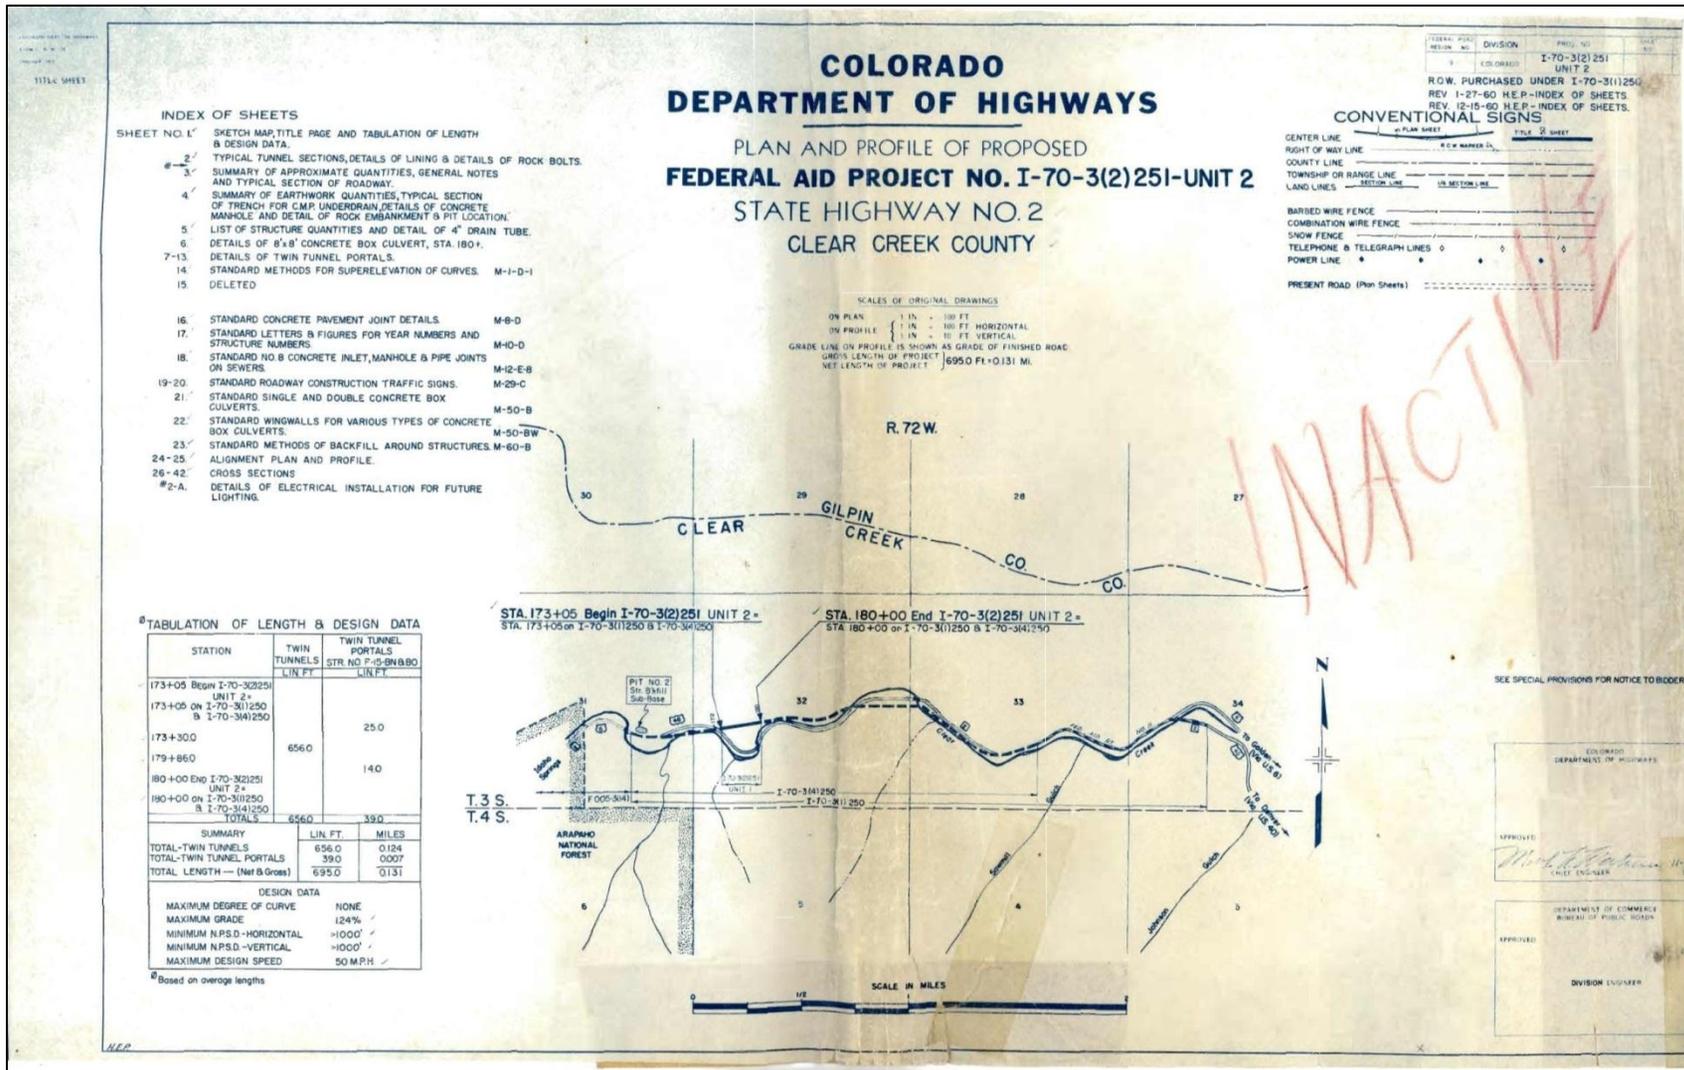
Twin Tunnel As Built Plans. Index of sheets and location map, 1961.
